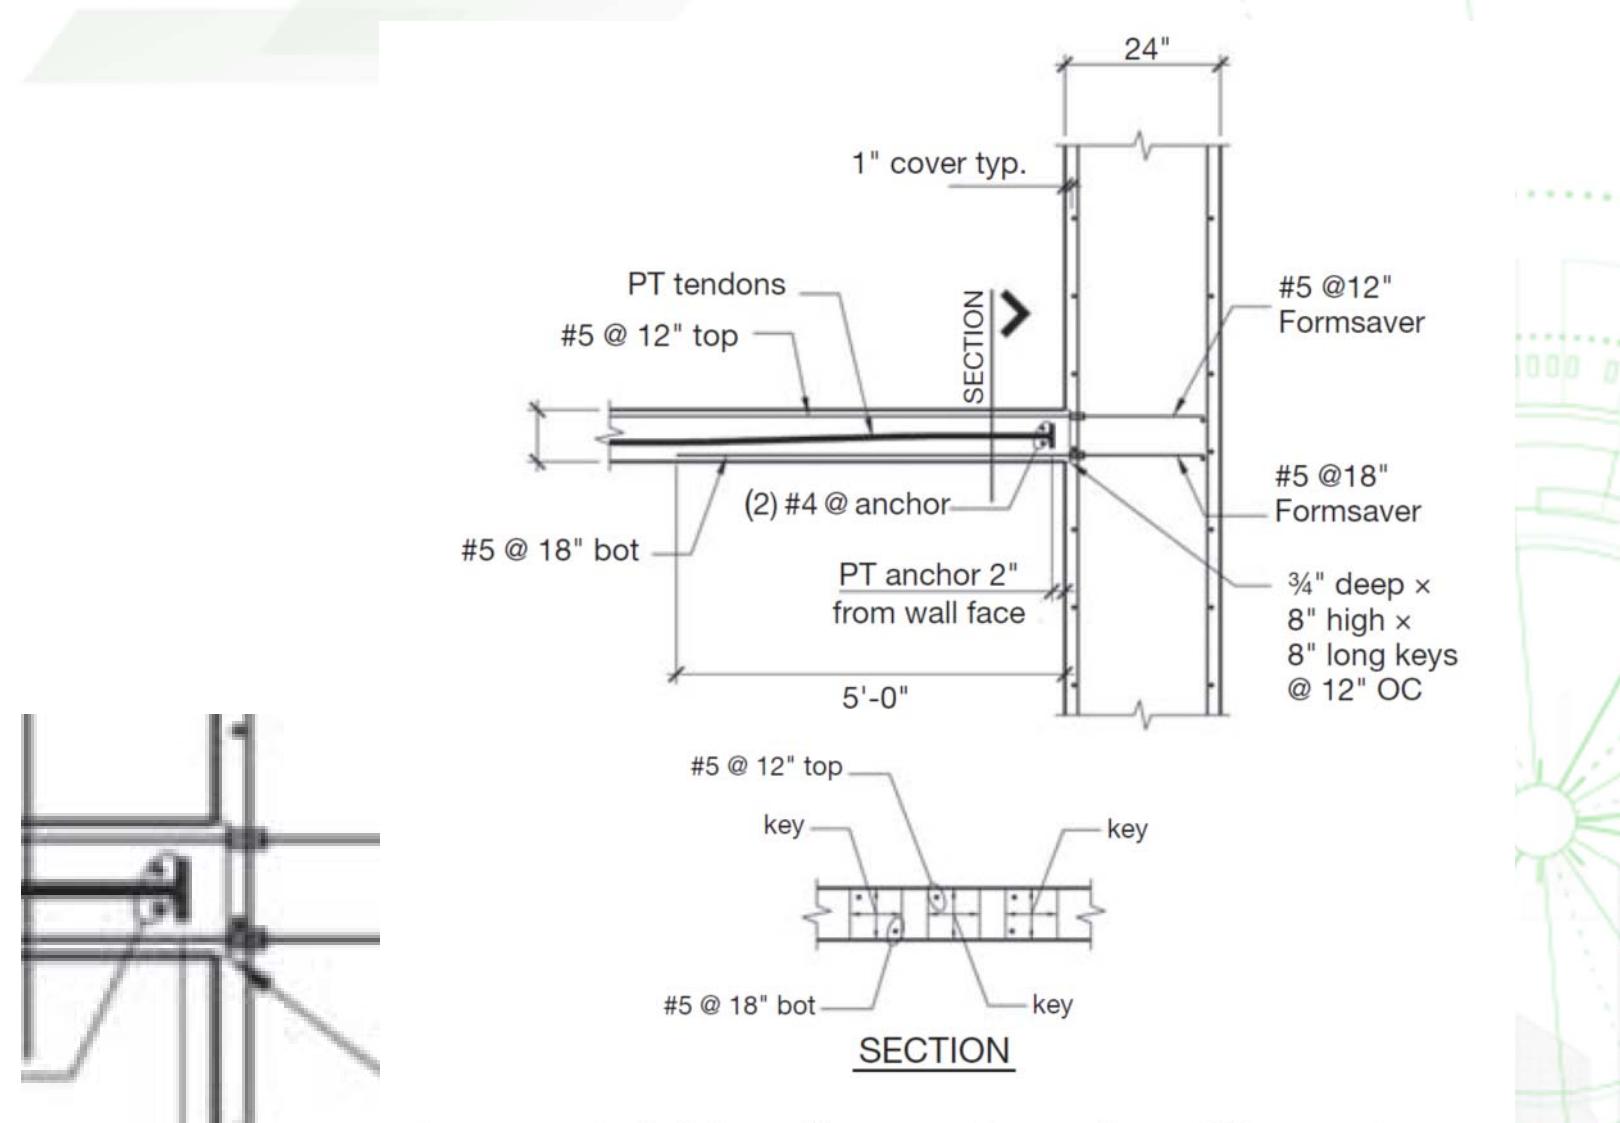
Typical Slab-Wall Connection and Detail for Specimen 1
